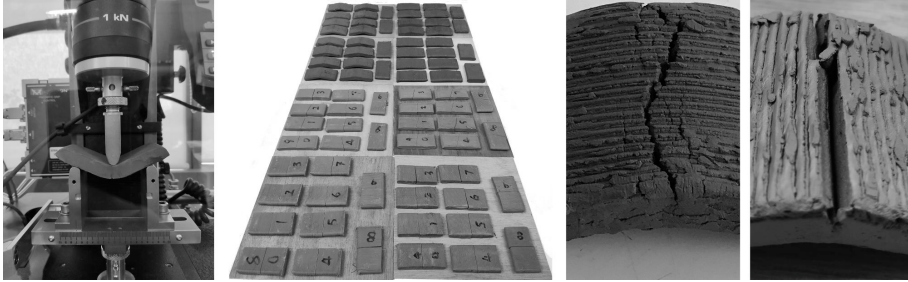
Images of bending tests. From the left: Testing environment, 80 specimens after testing, crack on the cross-layer direction, and crack between layers.
